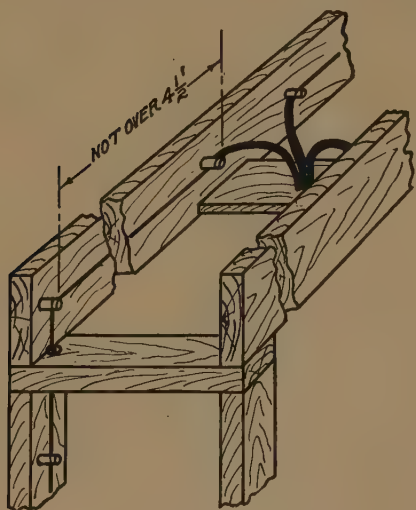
A sketch showing a ceiling outlet where the "loop method" is used. All wires are looped from outlet to outlet, as in conduit work, making all joints accessible.
